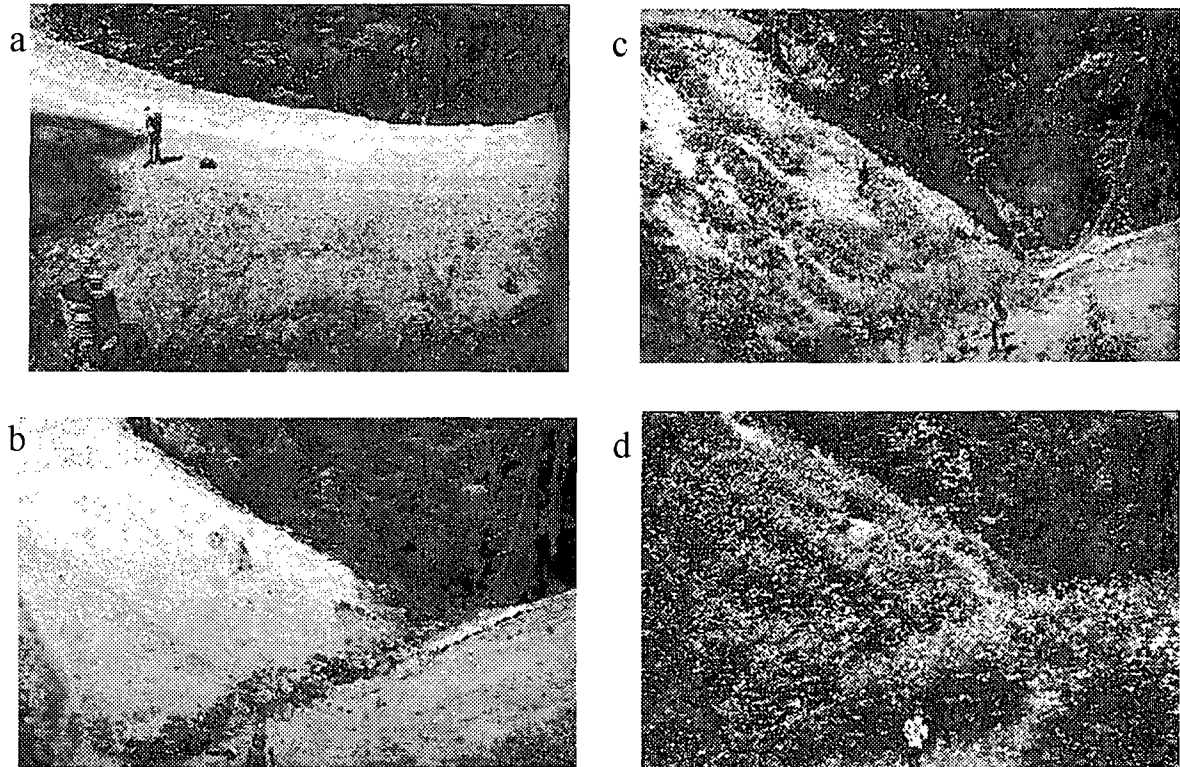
Typical stream channel excavation. (a) Abandoned logging road with intact culvert before treatment. (b) Immediately following stream crossing excavation. In this case, rock armour and check dams were installed on the channel bed to prevent downcutting. (c) Less than one year later, revegetation of the streambanks is well underway. (d) Three years after treatment, alders have revegetated most of the ground disturbed during treatment
